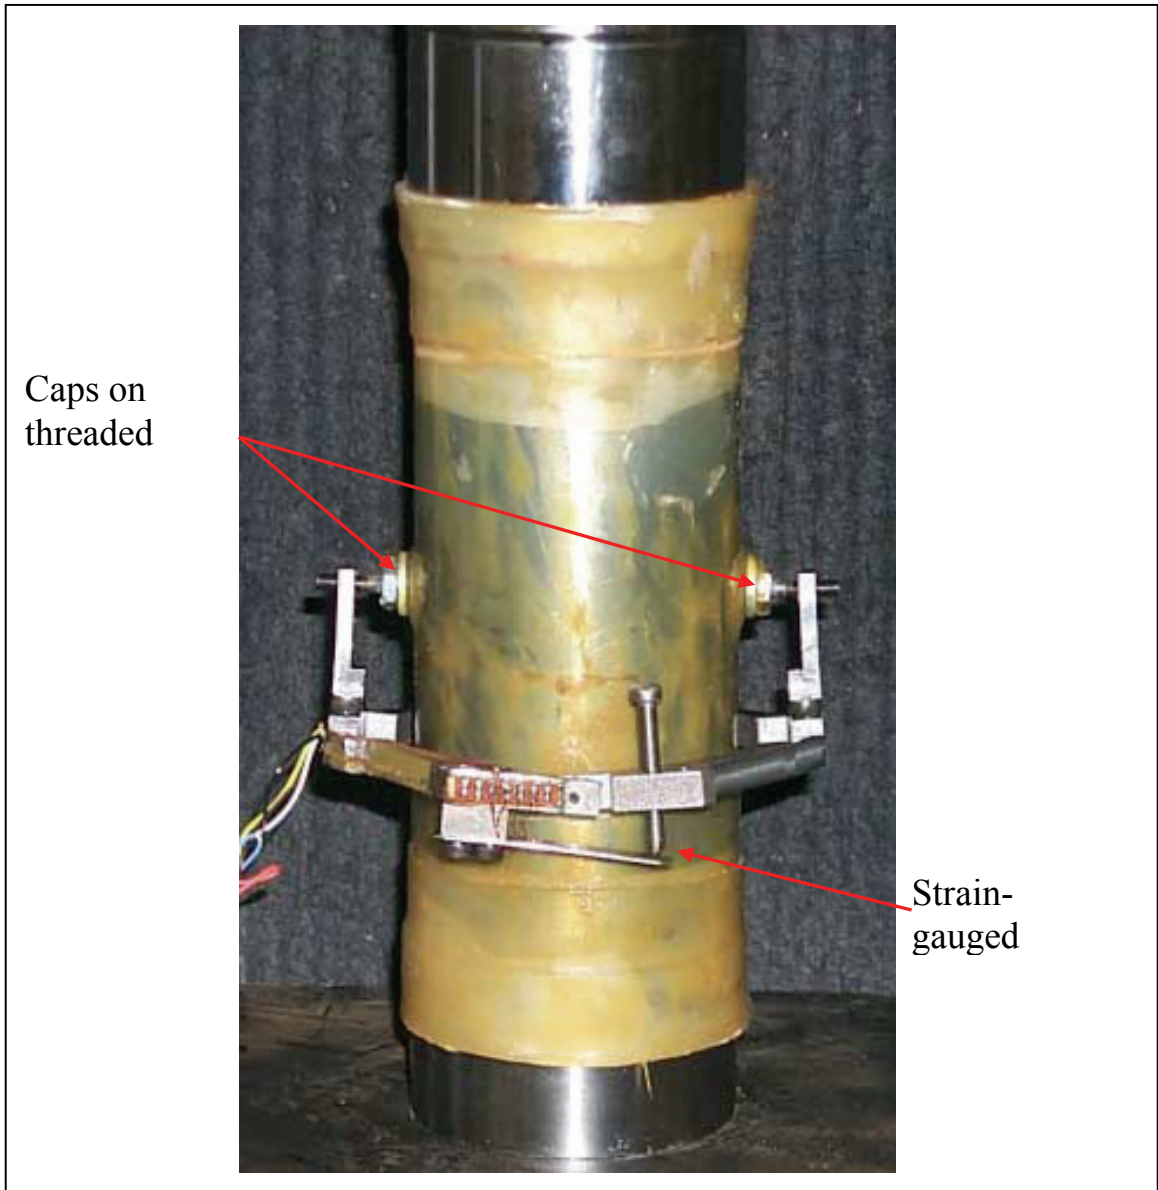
Spring-arm lateral deformeter mounted on test specimen
